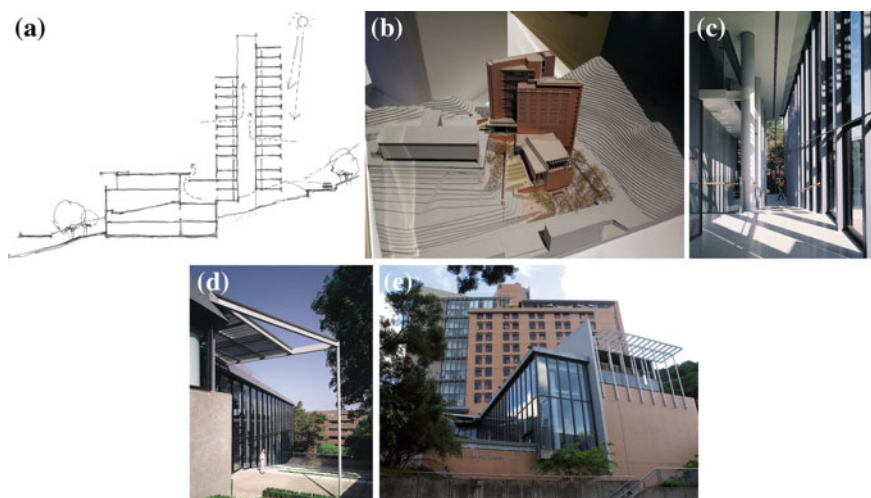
Graduate Hall, HKU, 1998. a Ideas on sketch. Courtesy of Dr. Rocco Yim. b Model shows how the buildings work with the hilly site. c Corridor next to the theater. d Hall entrance. e Building mass
